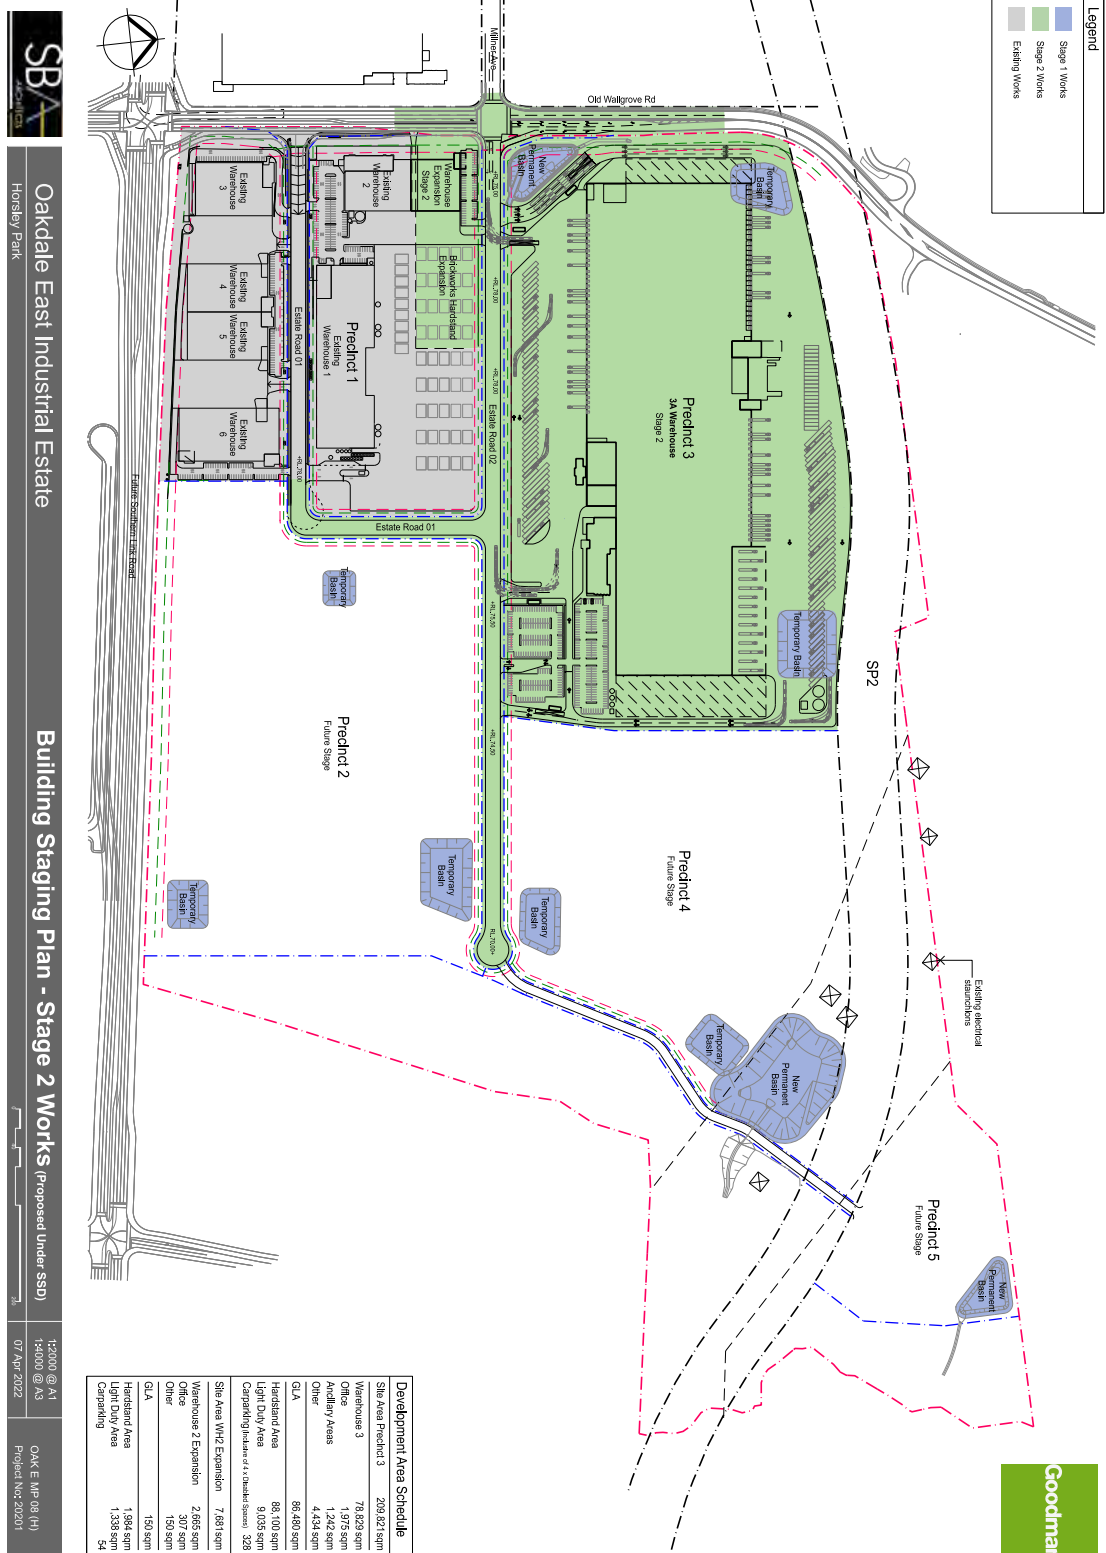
Building Staging Plan - Stage 2 Works (proposed under SSD).
